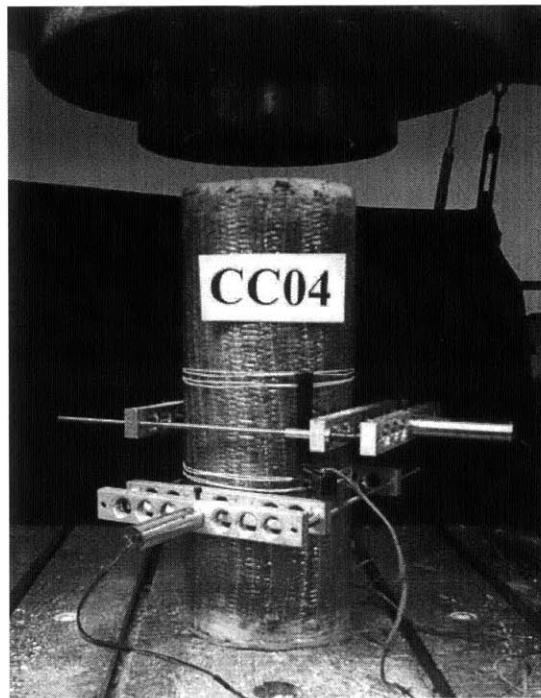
Set-up for instrumentation mounted on a FRP-confined concrete specimen
